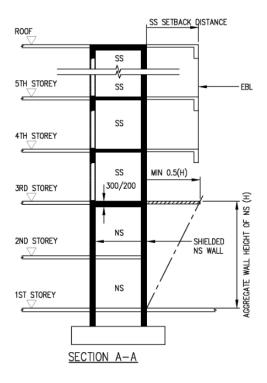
A: SHIELDED NS WALLS OF SS TOWER
